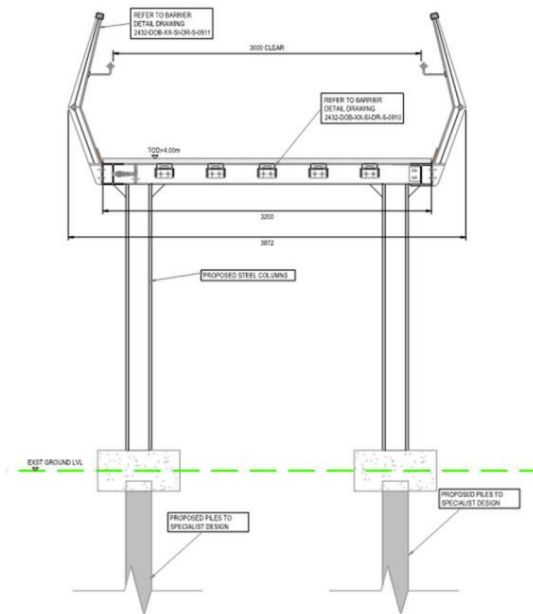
Typical Boardwalk section through Marsh (Source: DOB Consulting Engineers)
